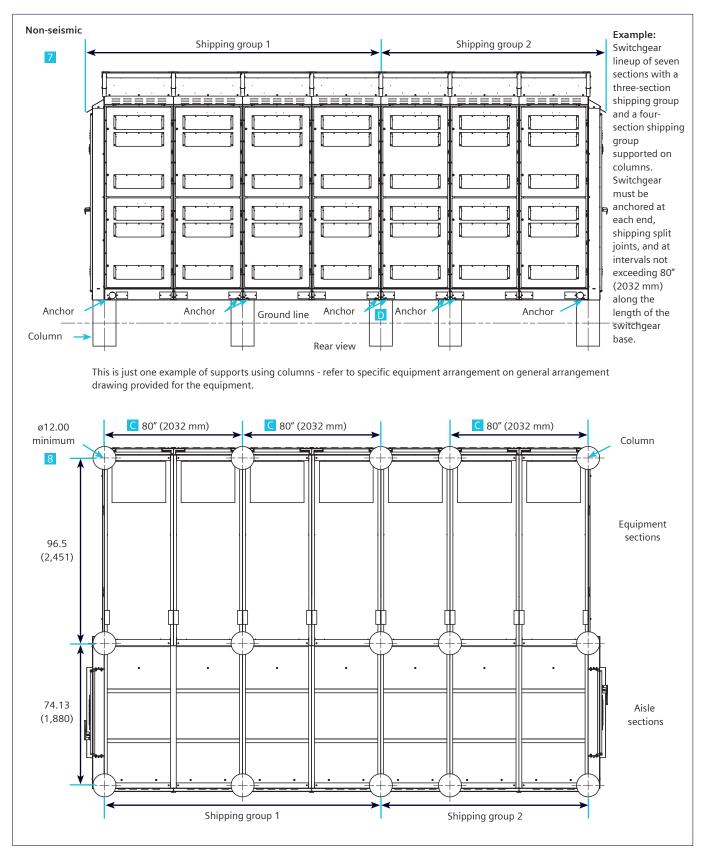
Anchoring outdoor type SGM-SG-AR Shelter-Clad single-aisle switchgear rated up to 17.5kV (continued)
